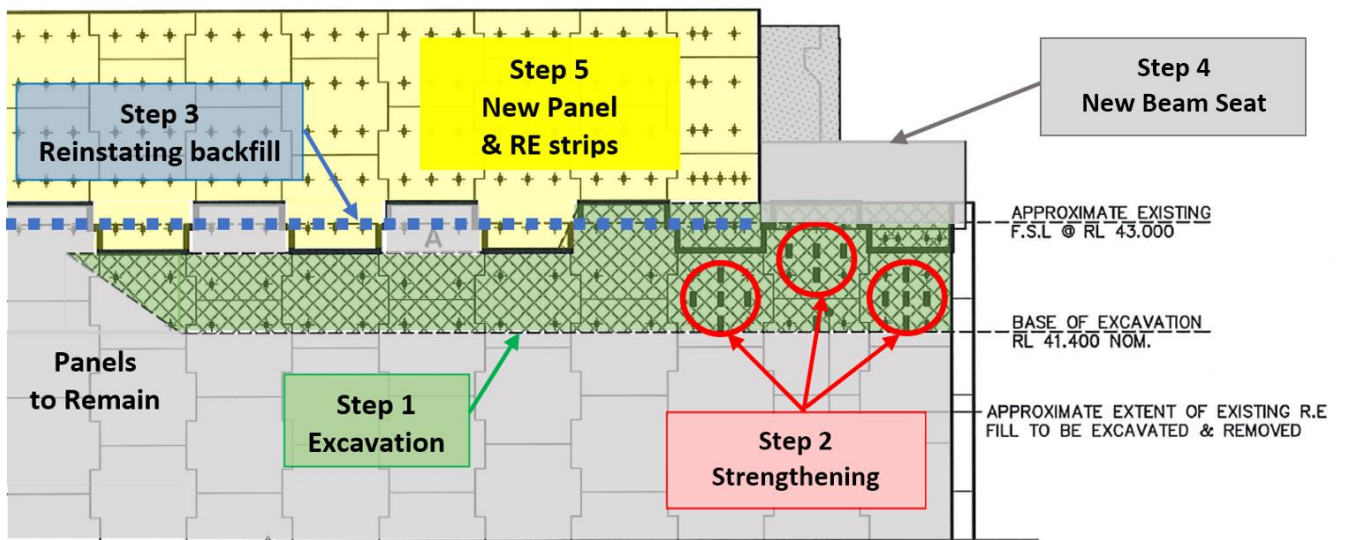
South West Wing-wall (extract from 2011 Design drawing) - Construction Steps
